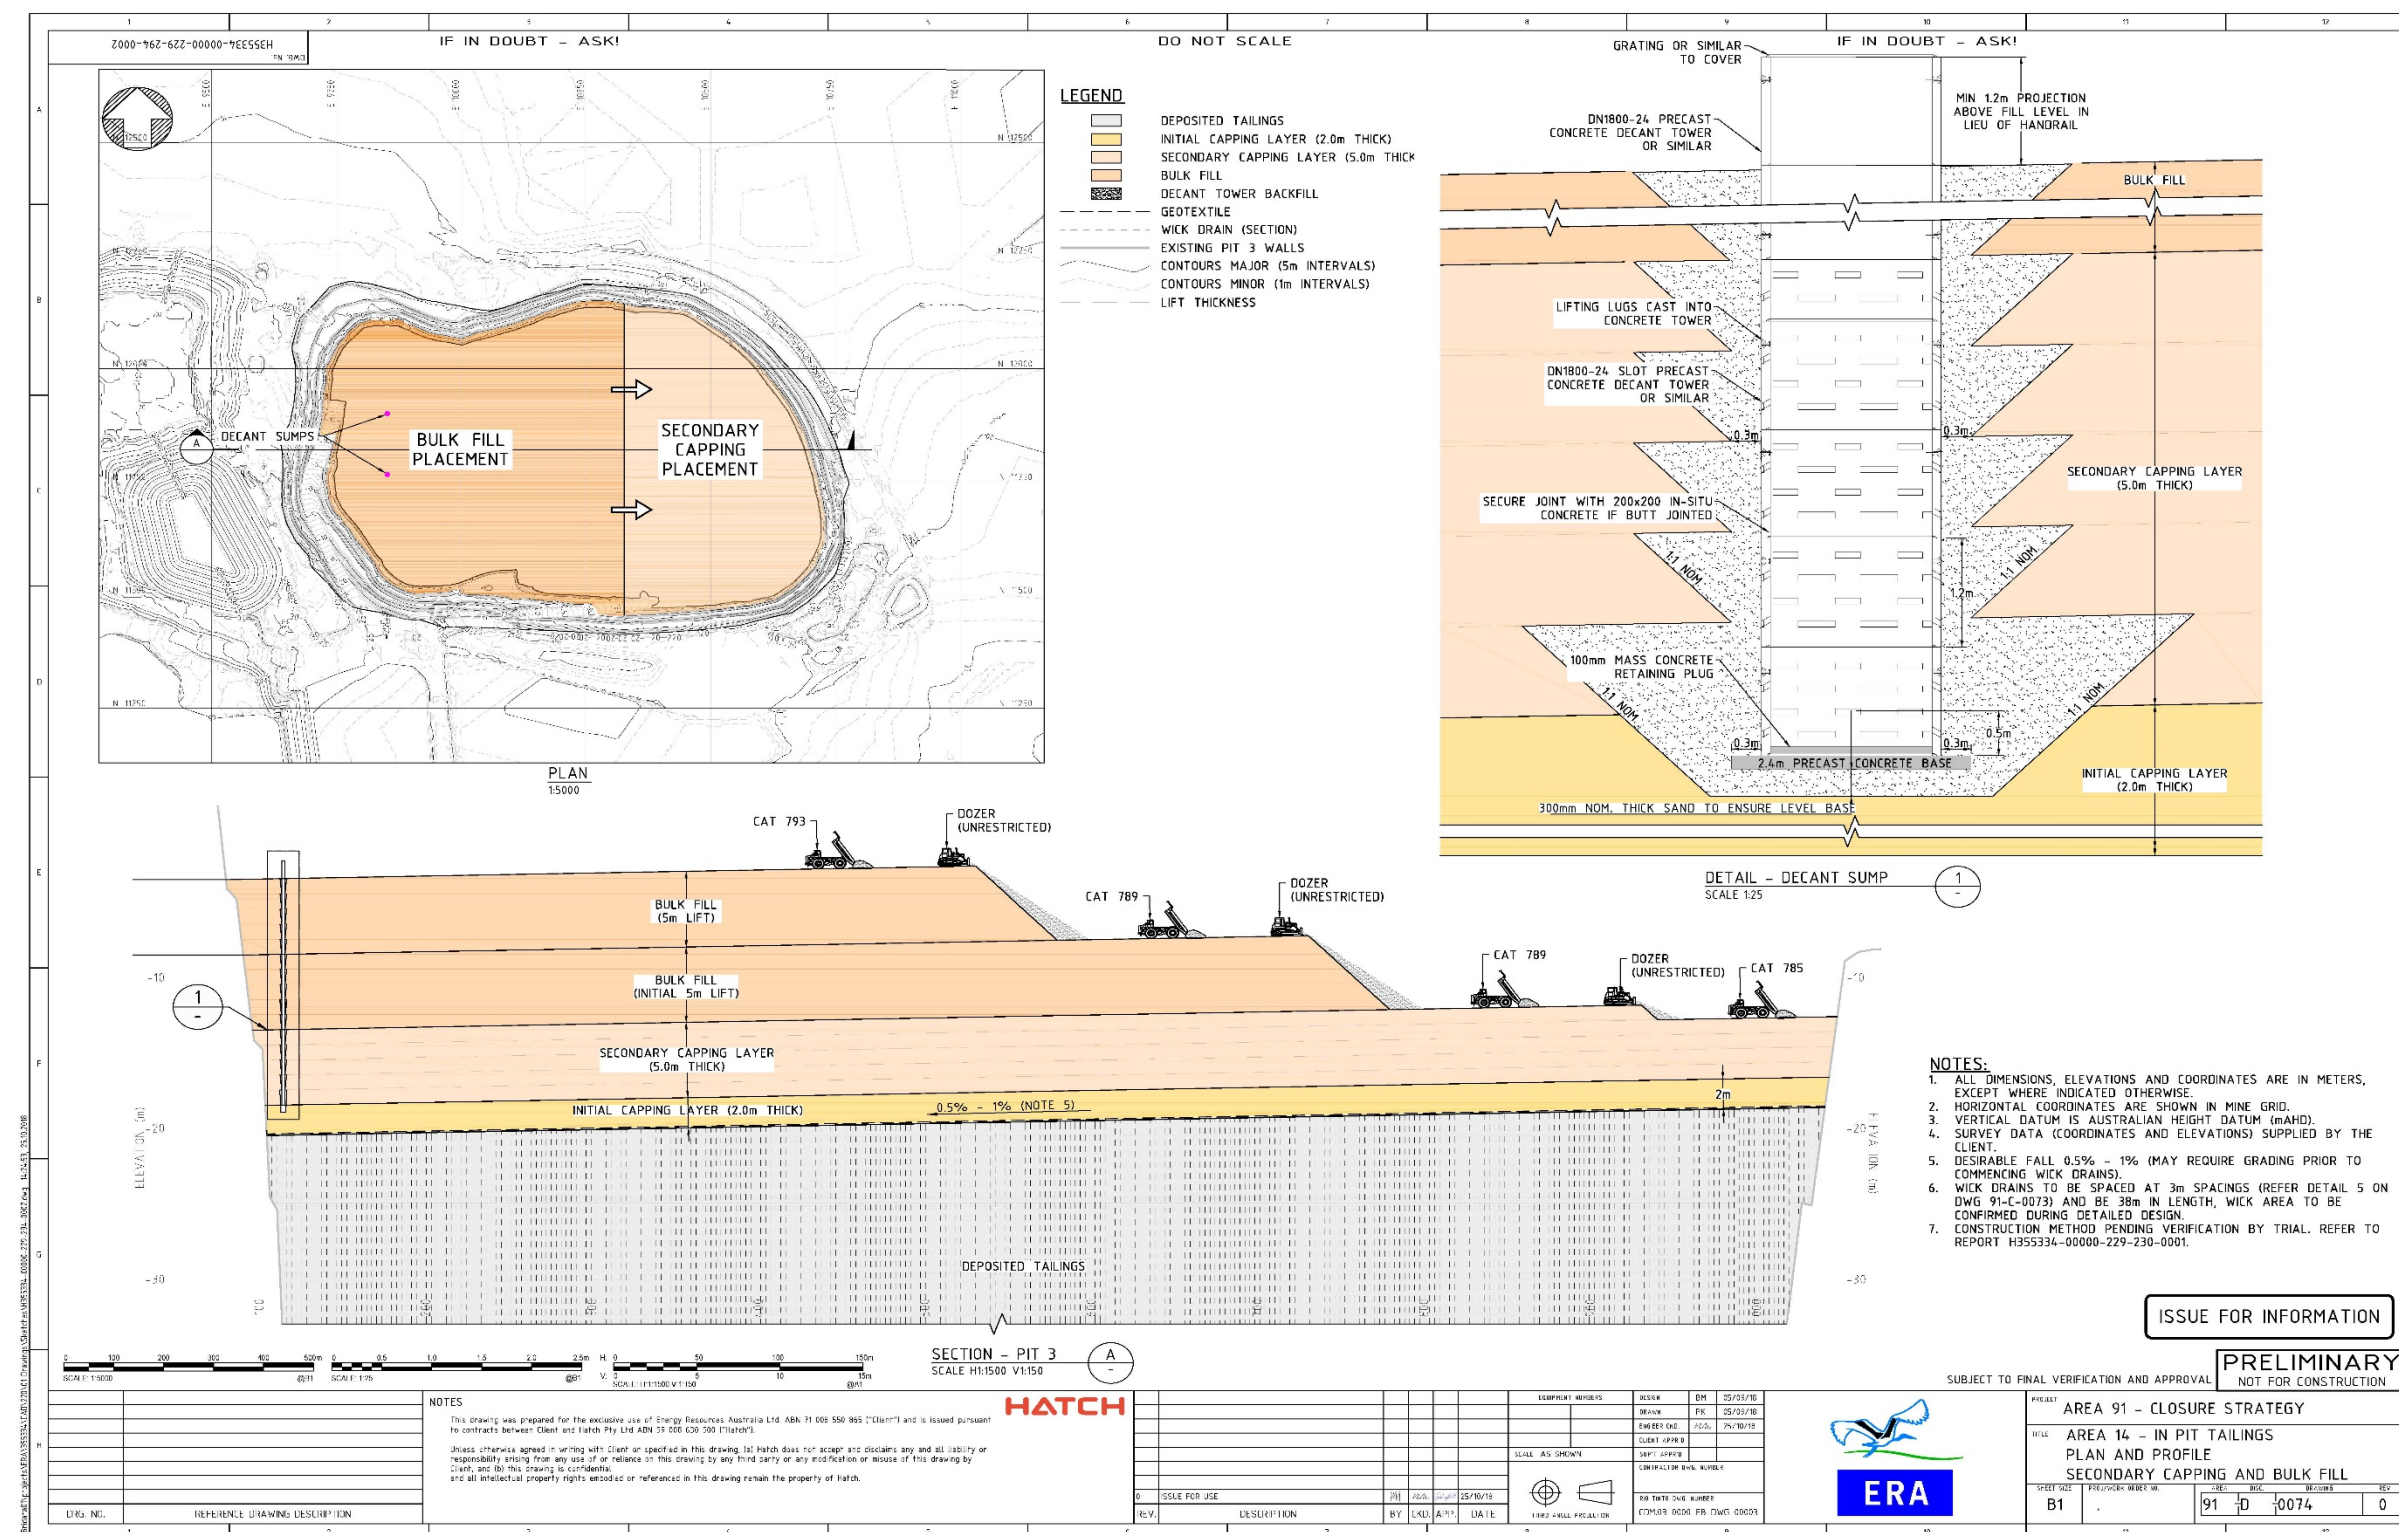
Pit 3 Secondary capping, decant wells and bulk fill plan
